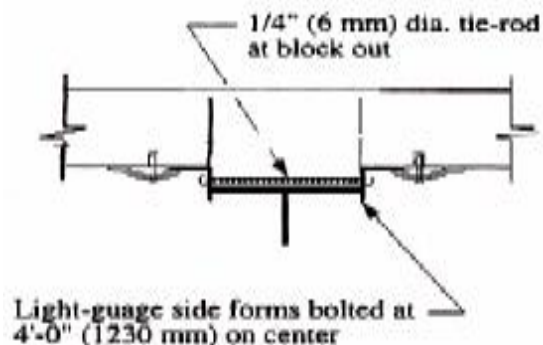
Connection Detail of the Queen Elizabeth Way-Welland River Bridge
